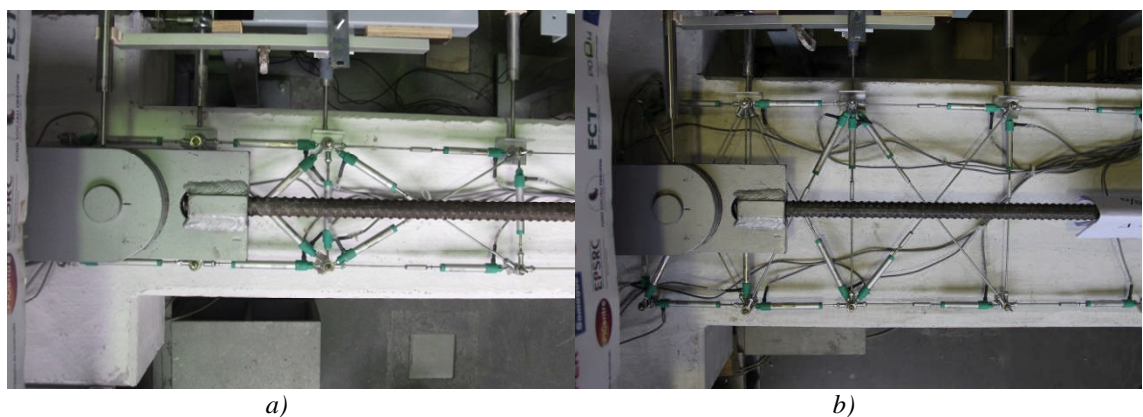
General overview of the deformation instrumentation in critical areas of: a) column-foundation specimens with 300x300mm sections; b) column-foundation specimens with 500x300mm sections.
